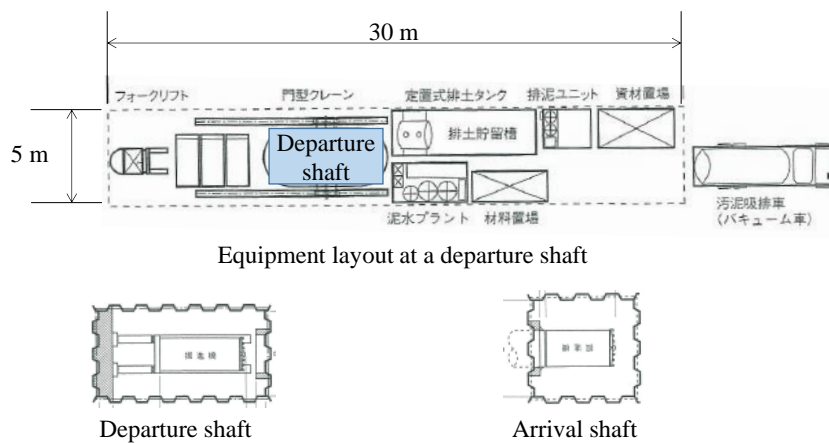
Examples of equipment layout at departure shaft and plane views of the shafts.
